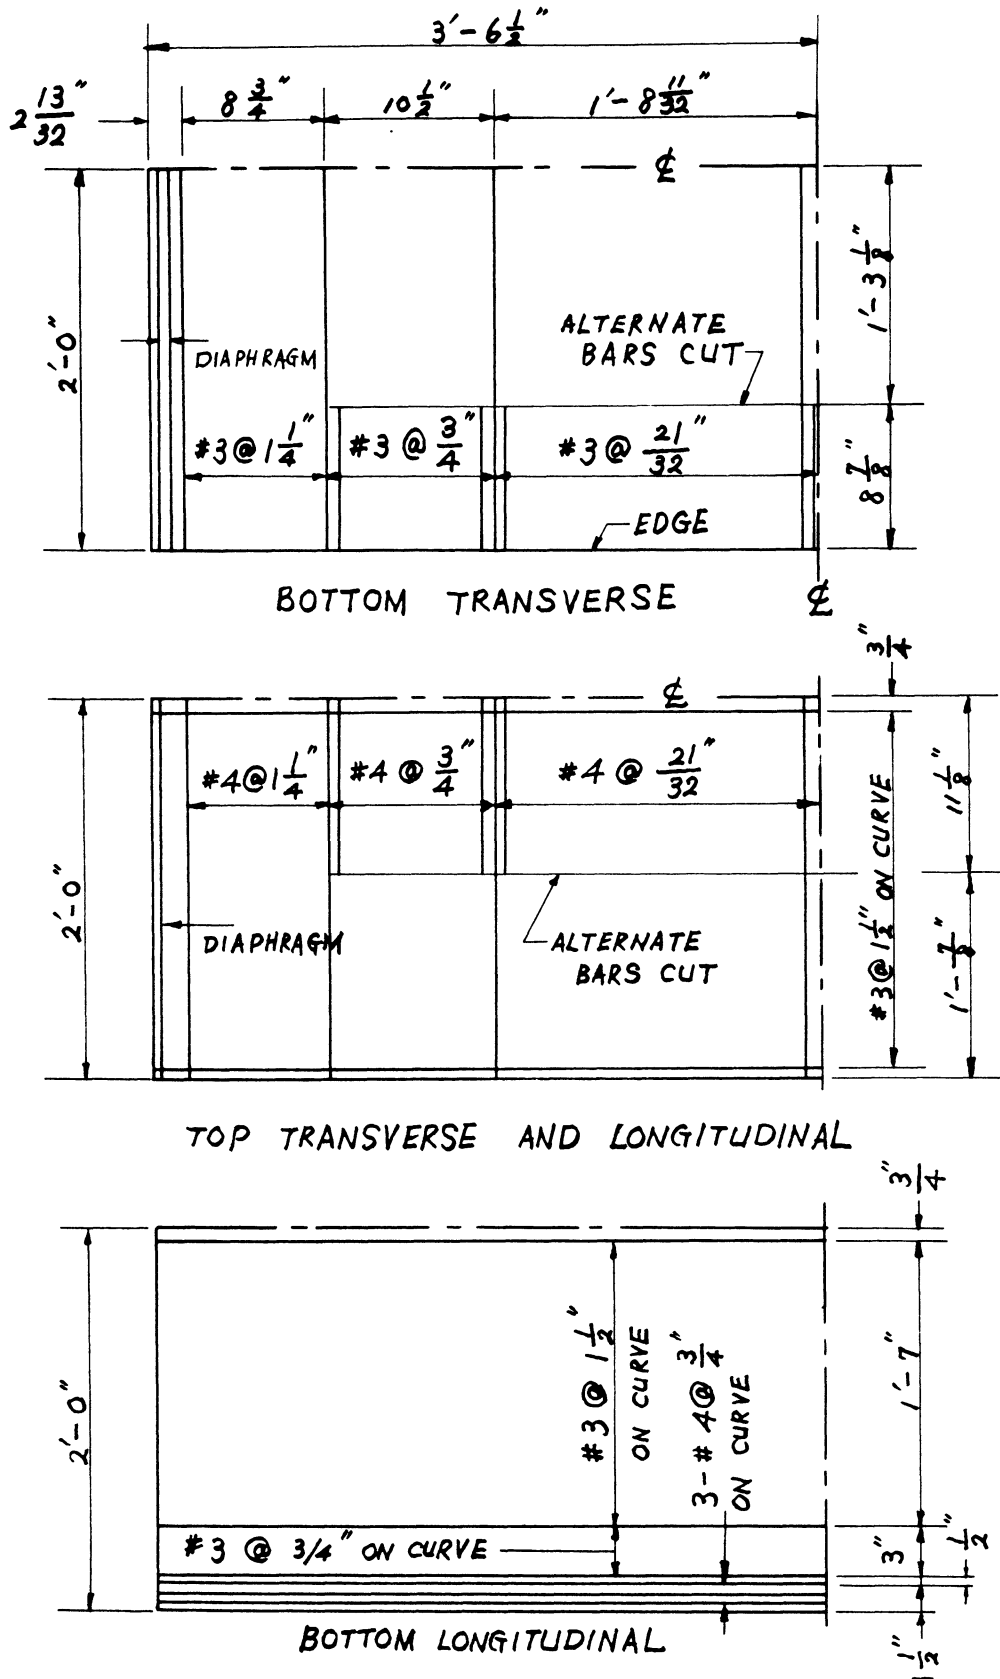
LONGITUDINAL AND TRANSVERSE REINFORCEMENT FOR EXAMPLE 6
